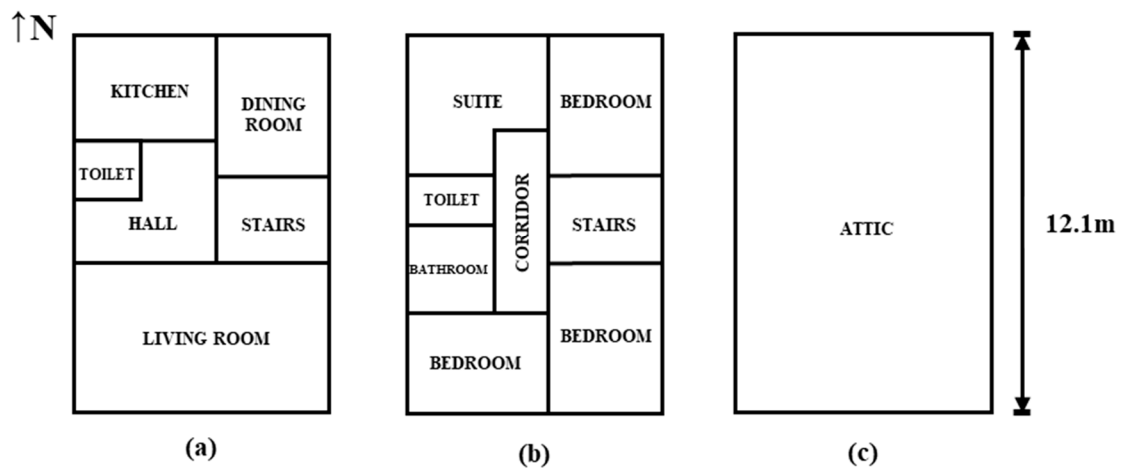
Plans of the building: (a) ground floor, (b) first floor, and (c) attic.
